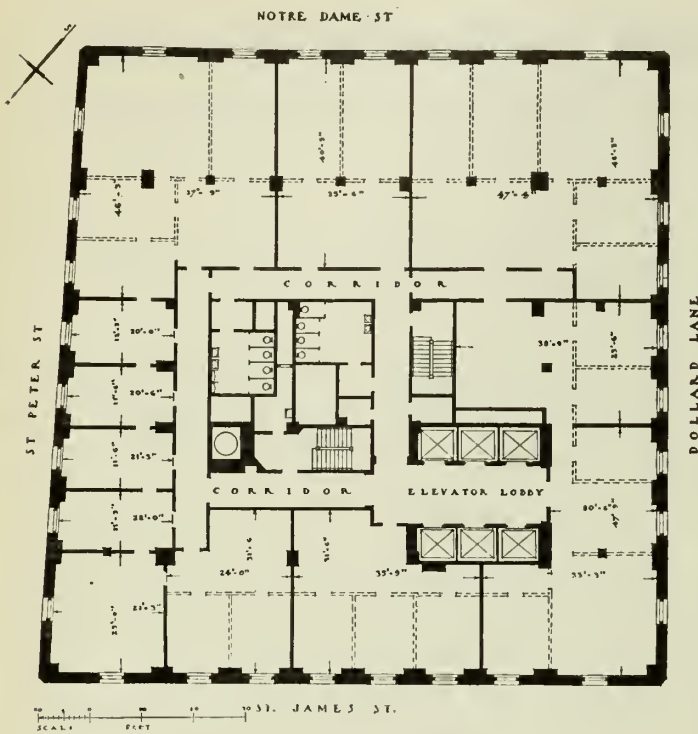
Typical Plan of Floors—Third to Eighteenth.
